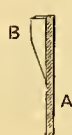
METHOD OF FIXING INNER BOUTS.
